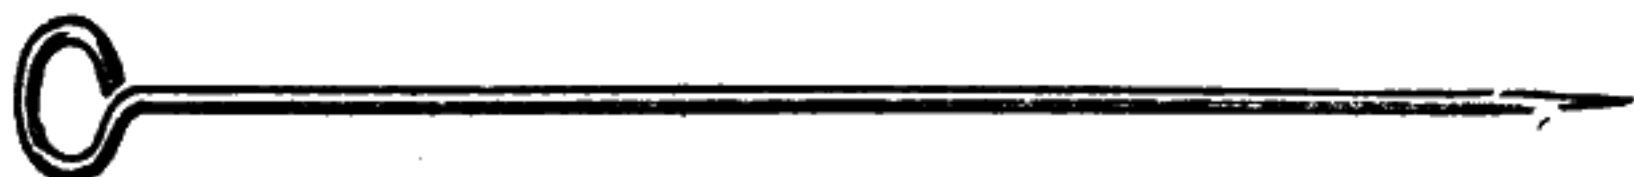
Sounding rod for examining the size and location of buried boulders.
